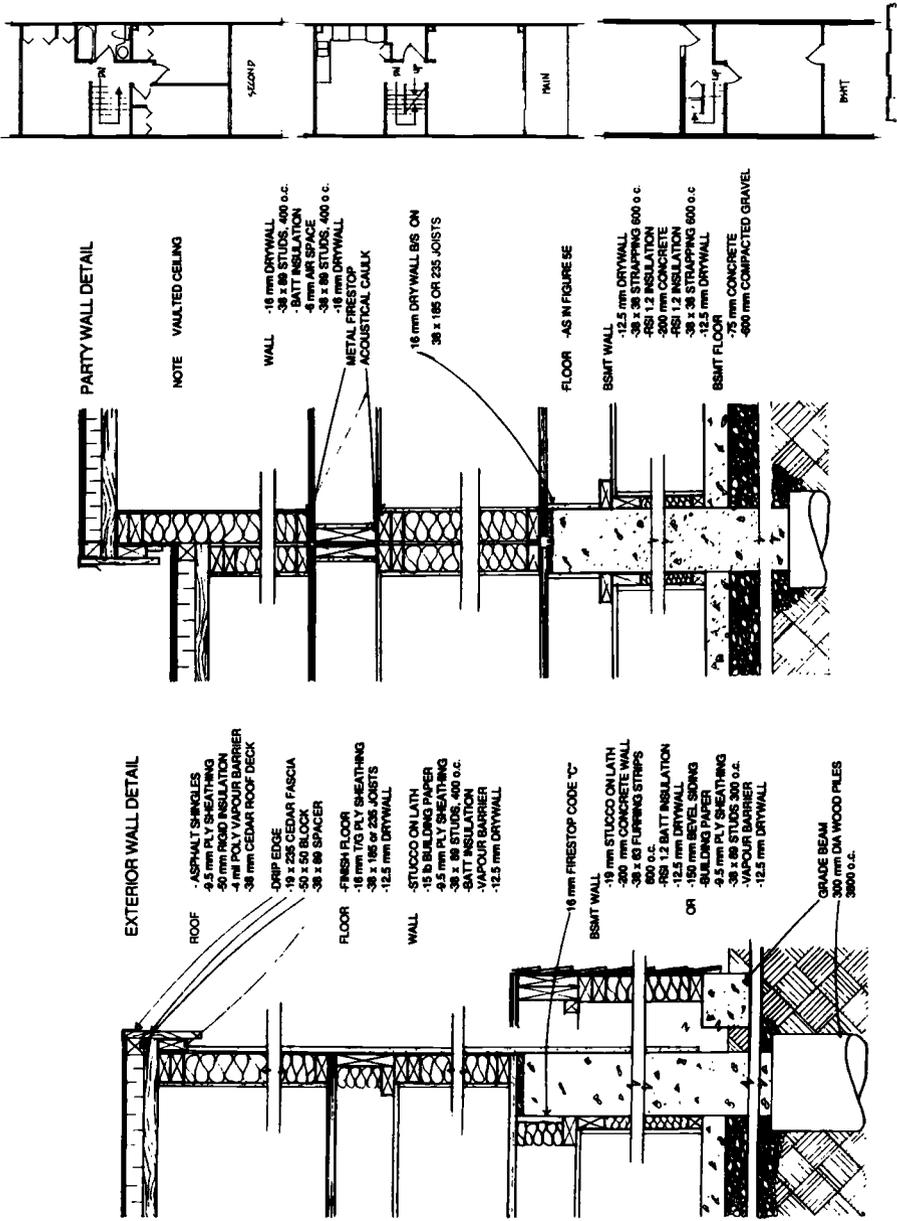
Exterior wall section, party wall section, and floor plans for Project 5.
